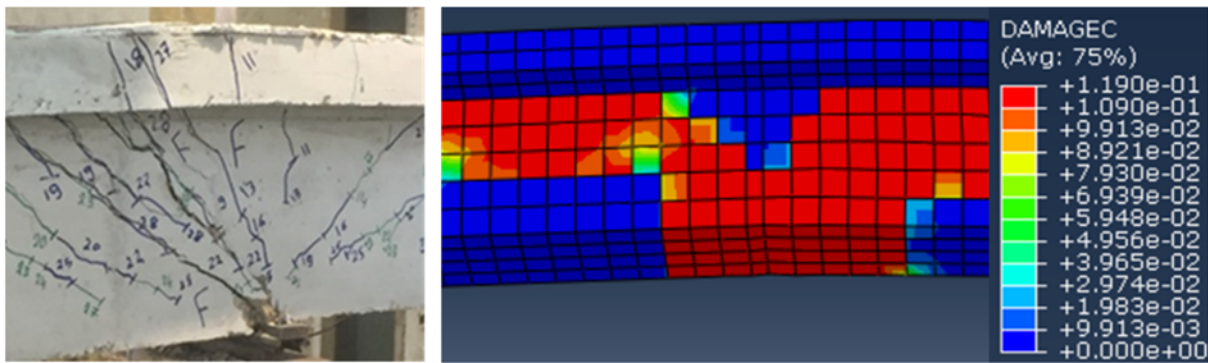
Concrete failure (compression damage) in beam S2
